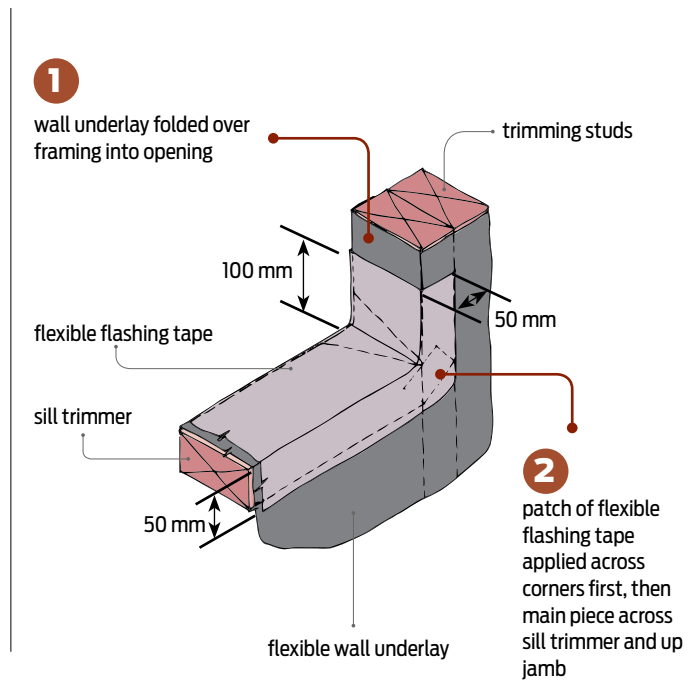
Steps 1–2: Install wall underlay and flexible flashing tape.
